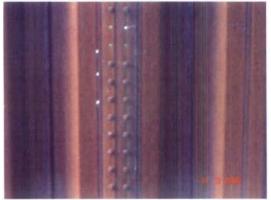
Missing bolts at connection east of Colfax Ave. and north of river.
